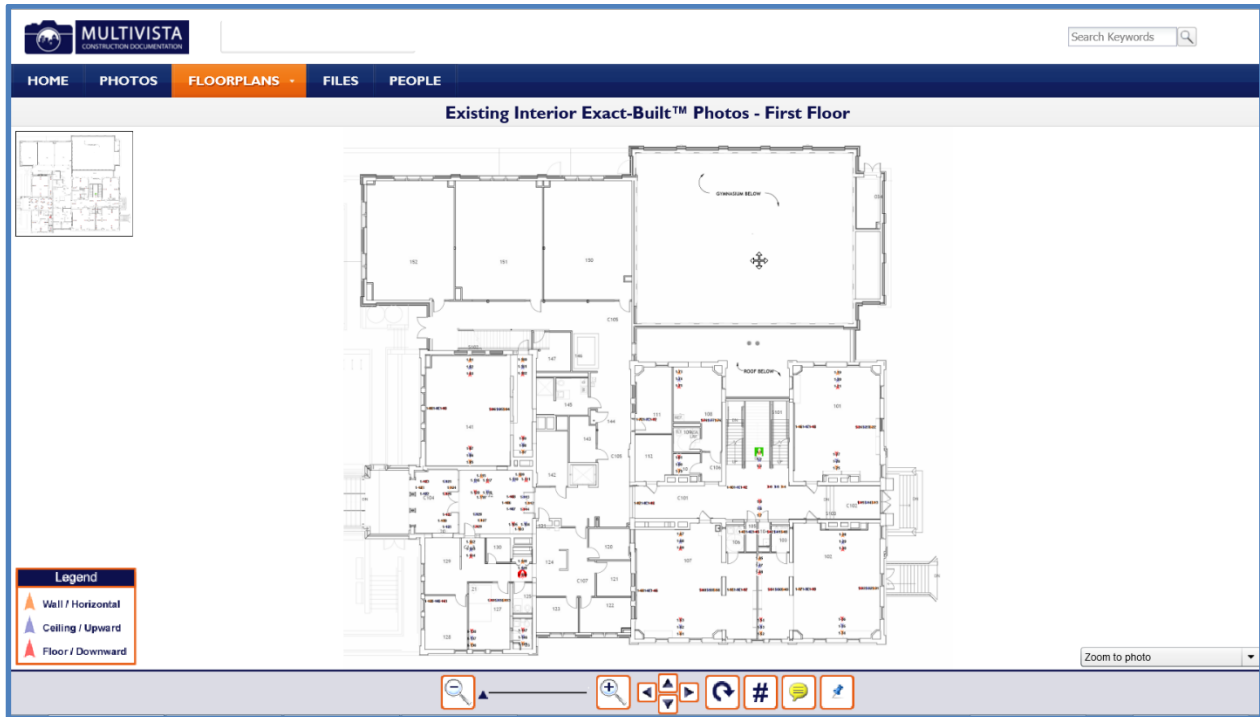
Example floor plan viewed on Multivista web-based software. (Multivista®)
